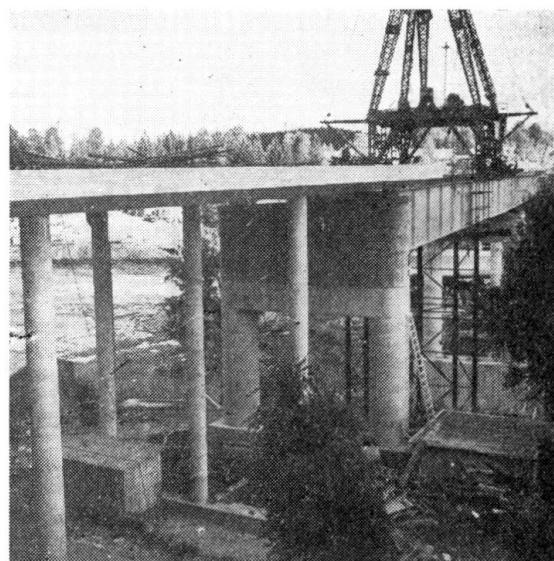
Concrete viaduct at Bergeforsen, Sweden
